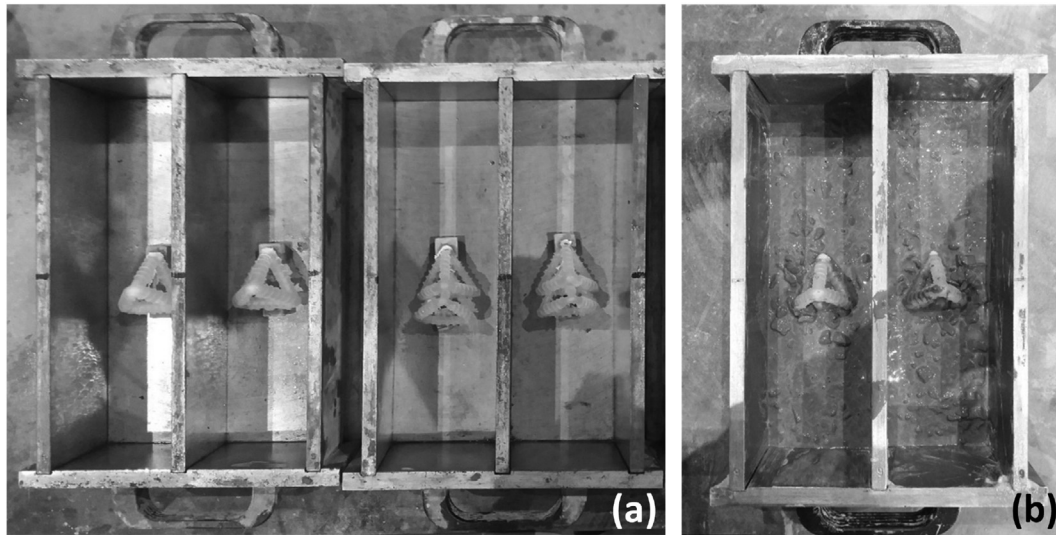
(a) d-TETs position fixed via 10 mm thickness concrete spacers; (b) specimens filled to 20 mm from the base of the mould.
